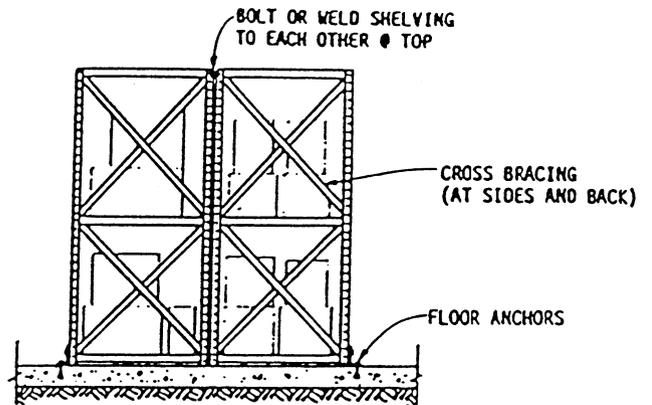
Approaches for Anchoring Storage Racks (Figure 4-67 of Reference 60)
